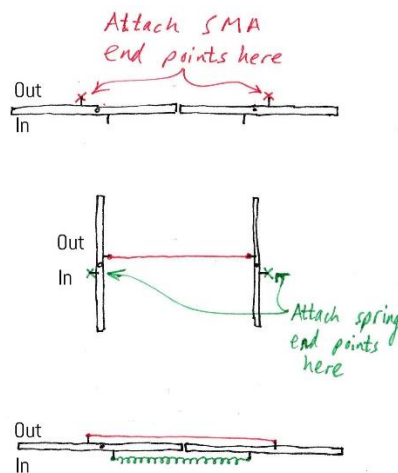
The logic behind the concept module, shown as a sequence of plan sections of a pair of vertical façade panels.
